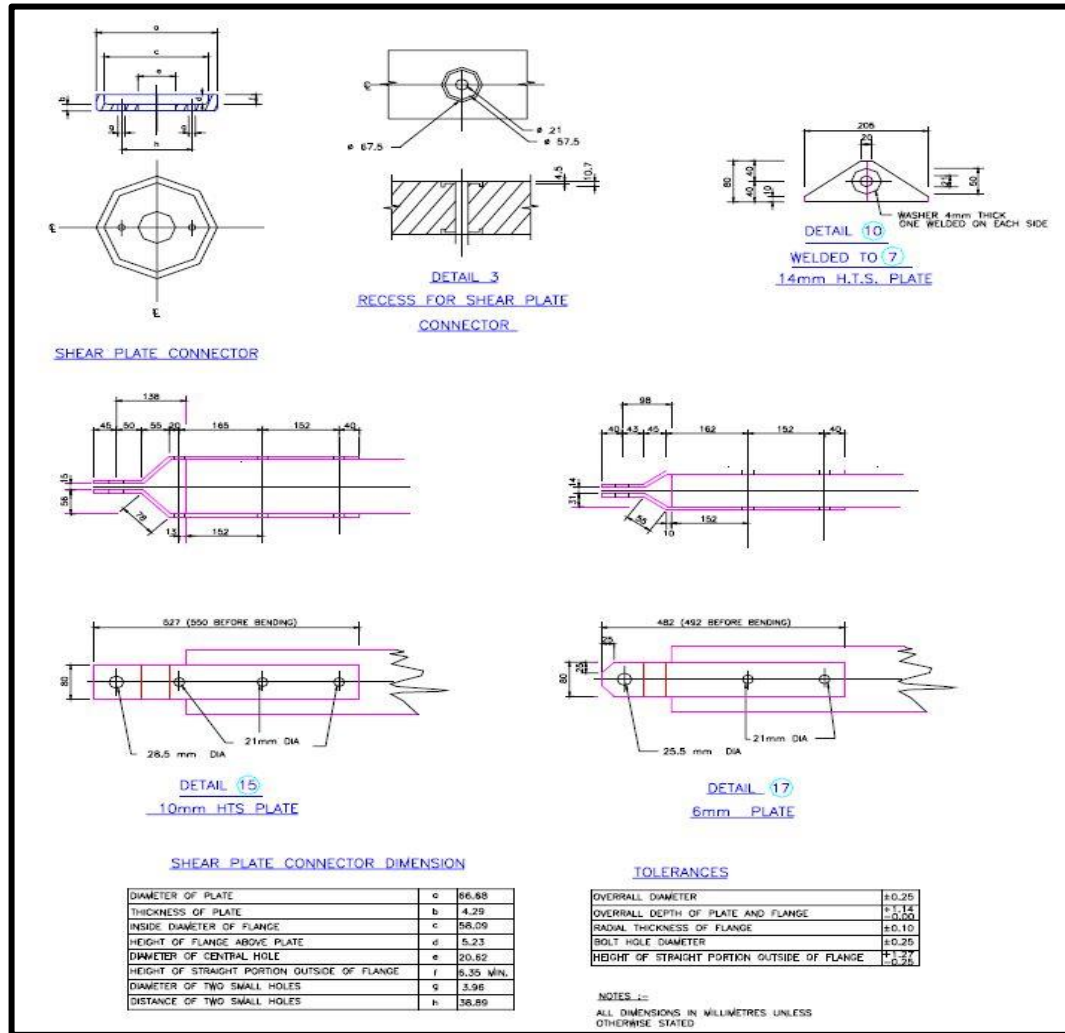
Detail Drawing of 275kV Composite Crossarm (Shear Plate Connector).
